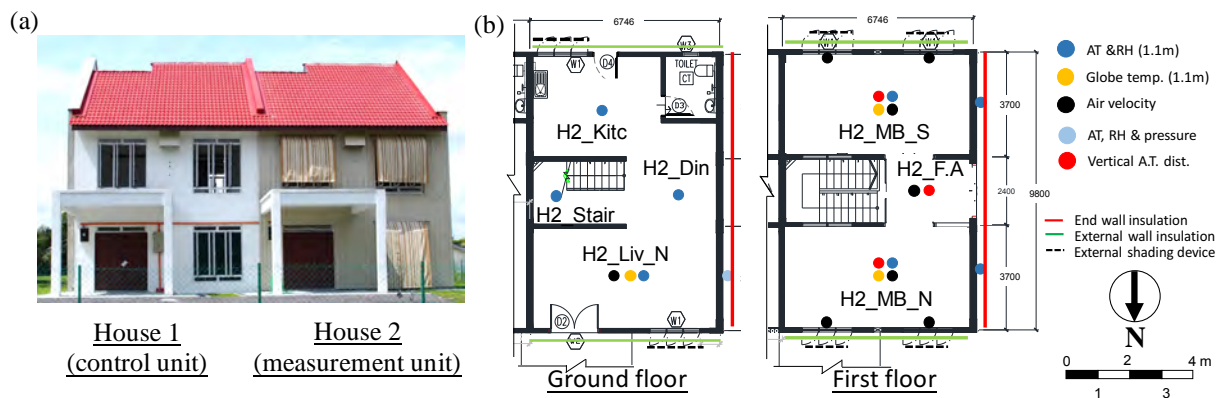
Energy-saving experimental houses in UTM campus. (a) Front view (b) Floor plans of the experimental houses. H2: House 2, MB: Master bedrooms, N: North, S: South, F. A: Family area, Liv_N: Living hall on North side. Din=Dining; Kitc=Kitchen; Stair=Staircase
